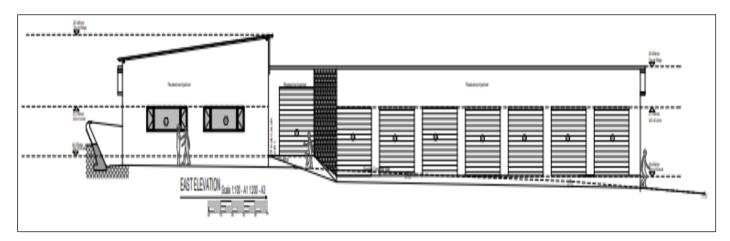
East elevation of the proposed new garages (TMBA, 2023)
